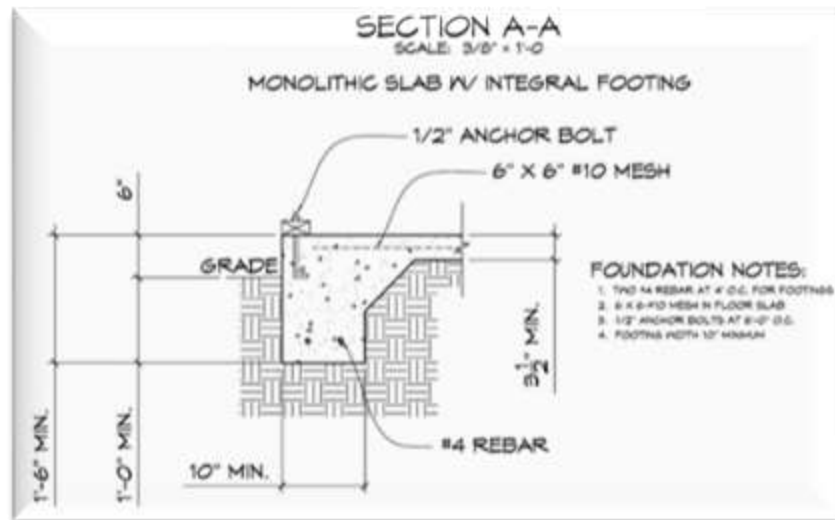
An AutoCAD® drawing of Figure 1.12.
